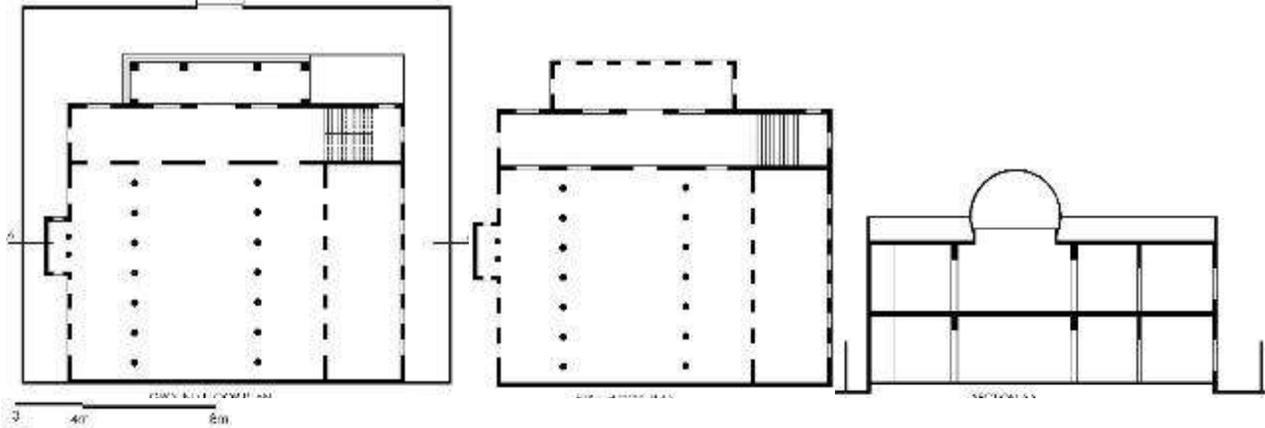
Ground floor plan, Abu-Bakr Mosque, Source: Author Figure 38First floor plan, Abu-Bakr Mosque, Source: Author
